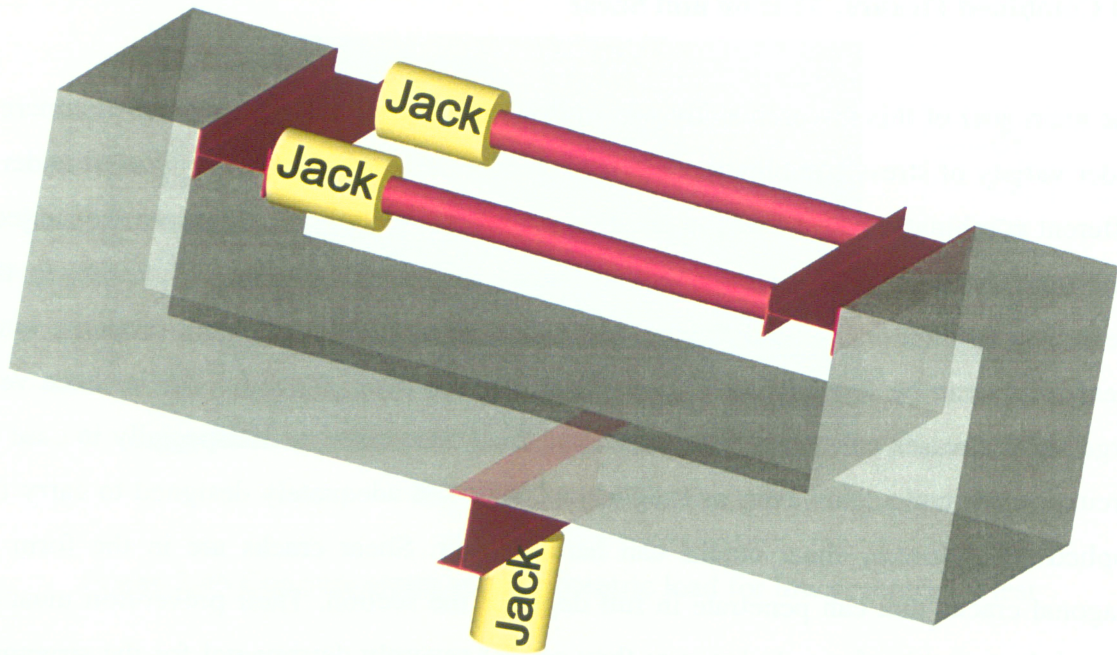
Combined test specimen and hydraulic jacks positioning
